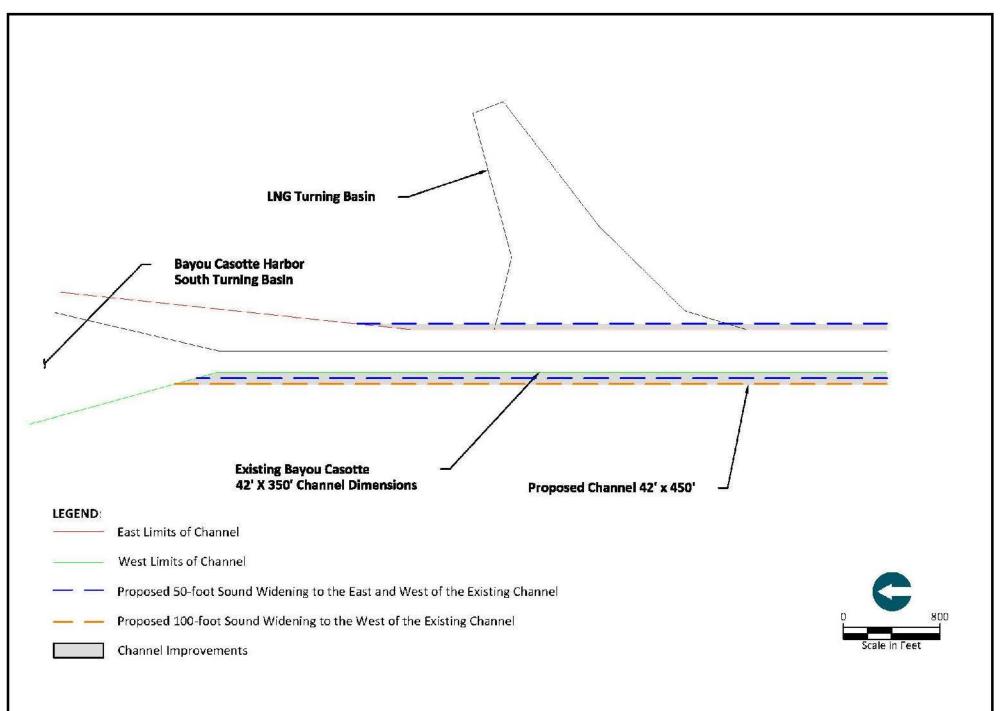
Sheet 1 of 4 Proposed Channel Widening
